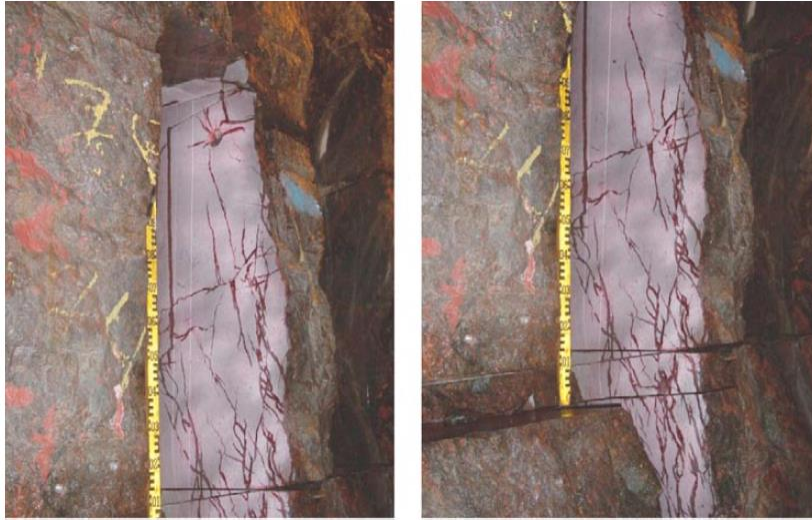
Dyed fractures from the excavation of the TASQ tunnel in Äspö Hard Rock Laboratory (Bäckblom, 2008)
